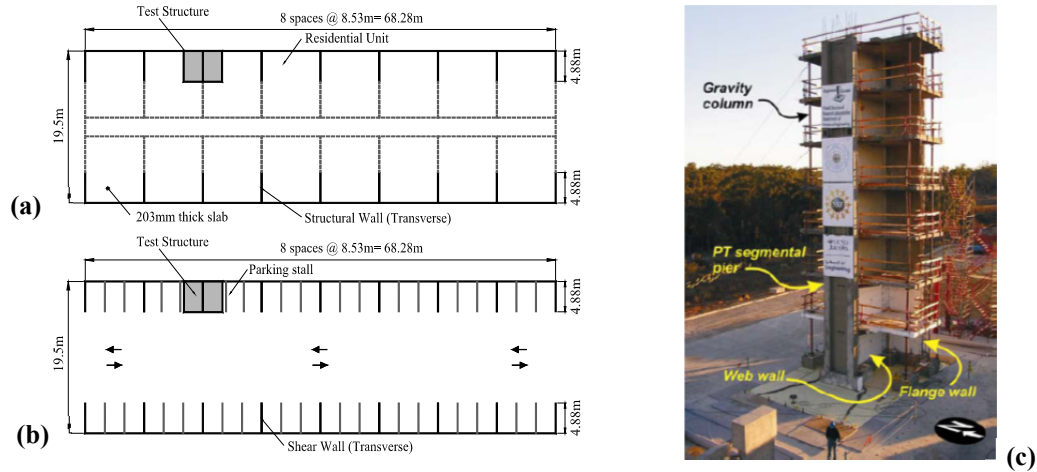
Plan of prototype building: (a) Residential floor plan; (b) Parking floor plan; and (c) Perspective view (Panagiotou et al., 2007)
